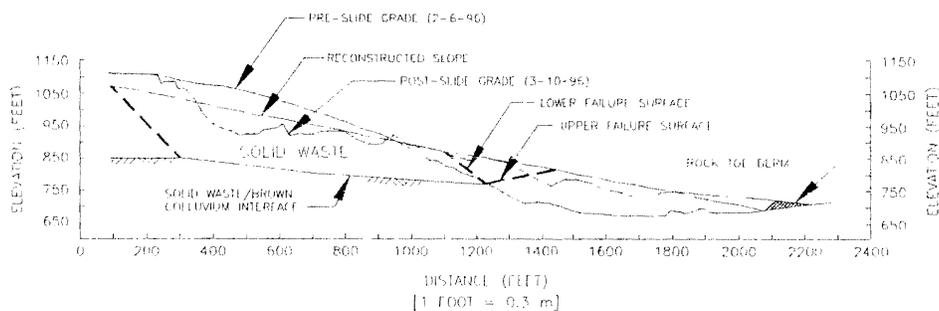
Slope cross-section showing reconstructed slope and critical failure surfaces
